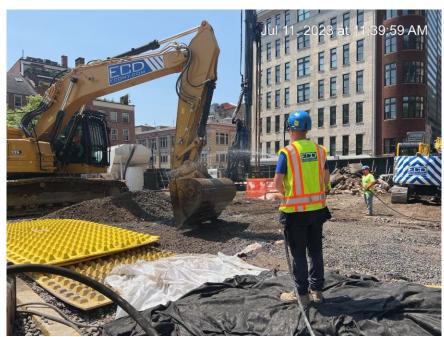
ECD exacavating soil/fill in the northwestern part of the site (facing southwest)
